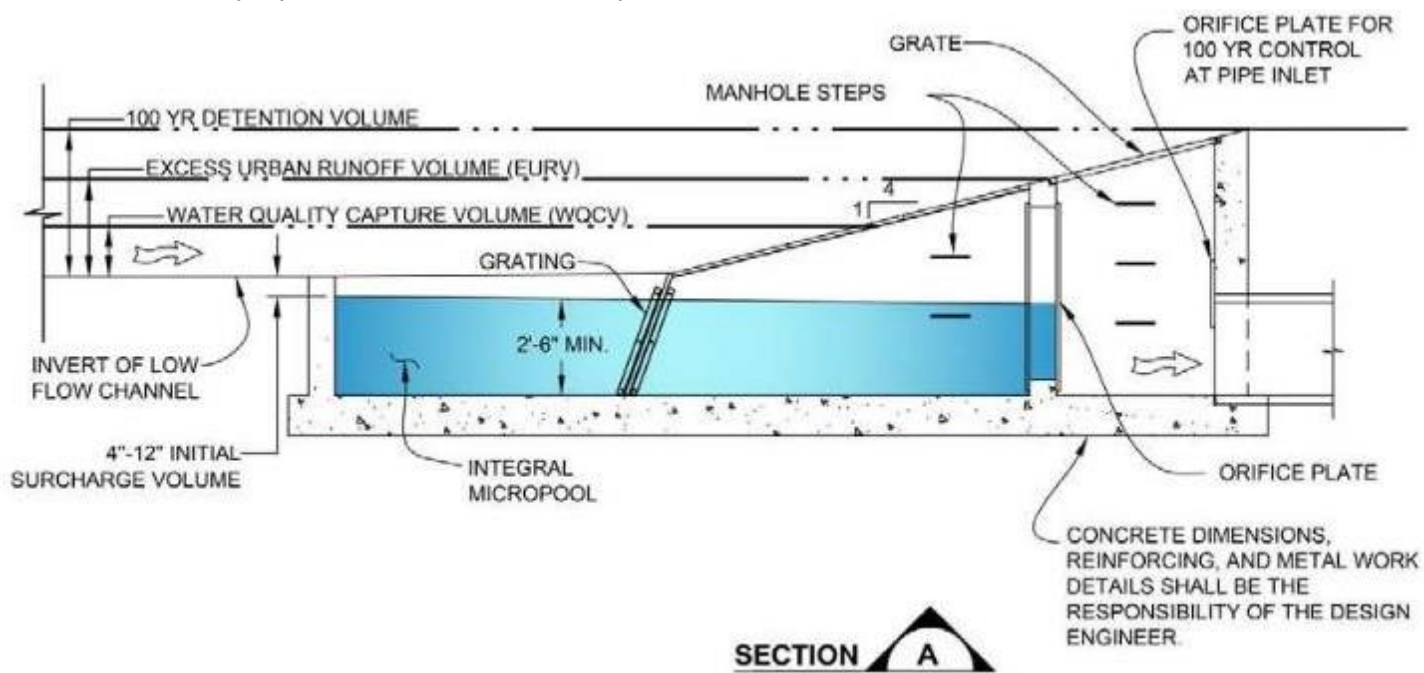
DCM Chapter 13, Figure 13-10: Concept for Outlet Structure with Parallel Wingwalls
